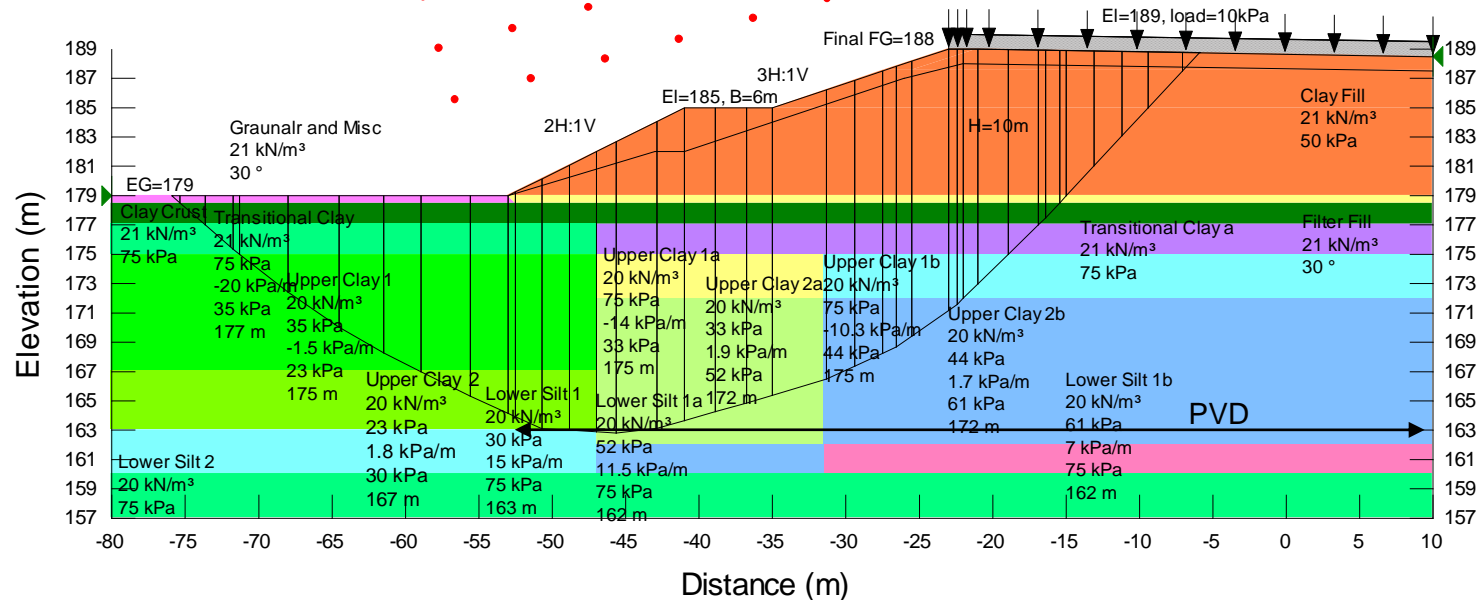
Slope Stability Result – Section 2 (Sta. 10+600W) – Stage 4 (Final Config) – Short-term Loading
